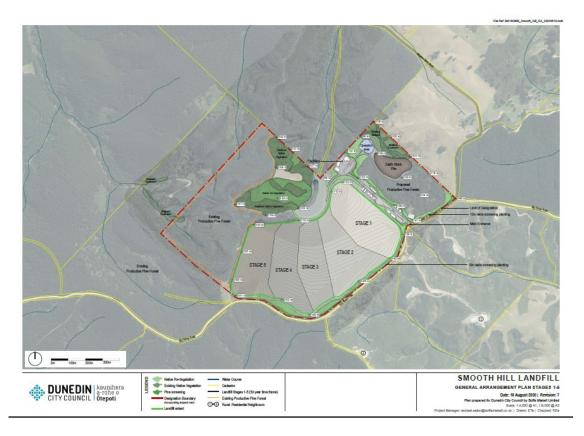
General Arrangement Plan for proposed landfill. (August 2020)
